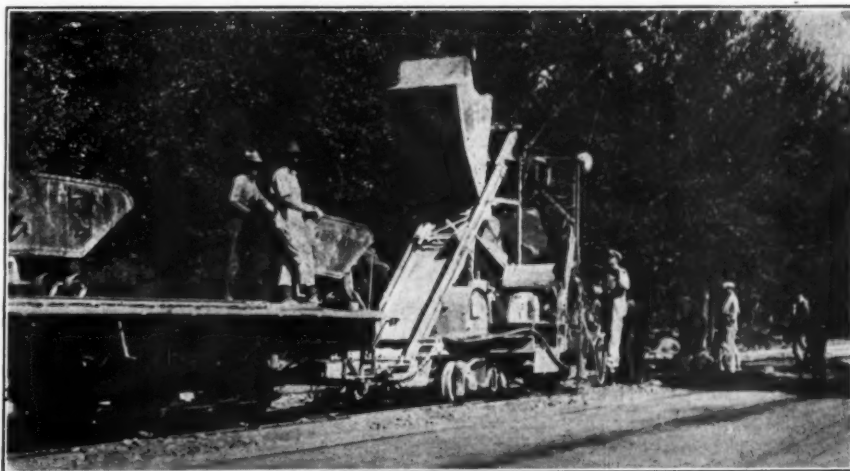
STREET RAILWAY PAVING GANG AT WORK ON COLORADO BOULEVARD.
